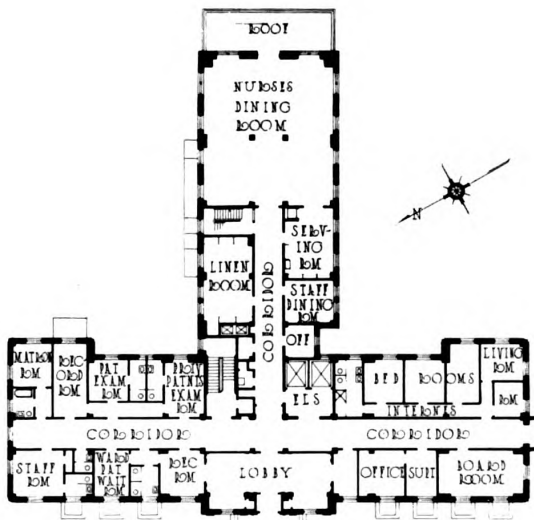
First Floor Plan of Isolation Building, Rockefeller Institute for Medical Research, New York
